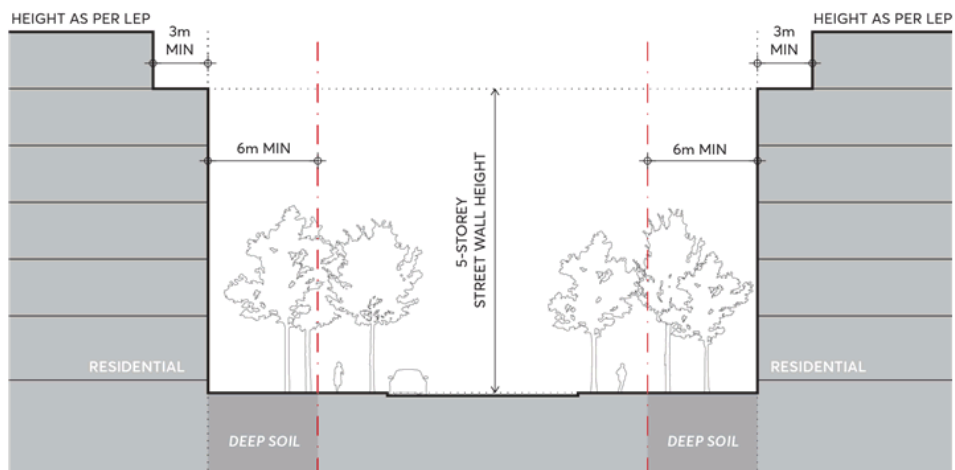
Street setbacks and street wall height for sites with a 24m height limit
